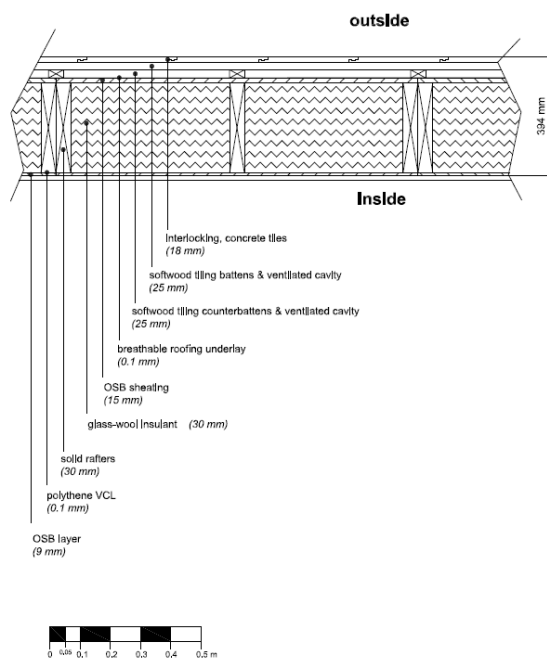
Roof B (pre-fabricated and pre-insulated cassettes), cross-section.
